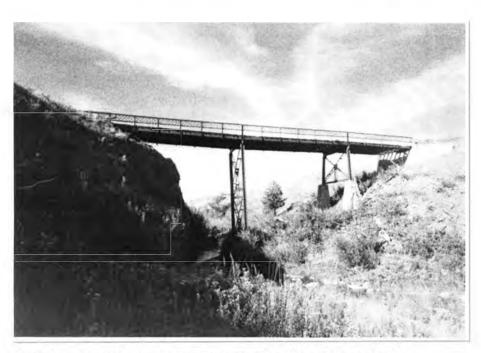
Shonkin Creek Bridge. South elevation. View to the northeast
